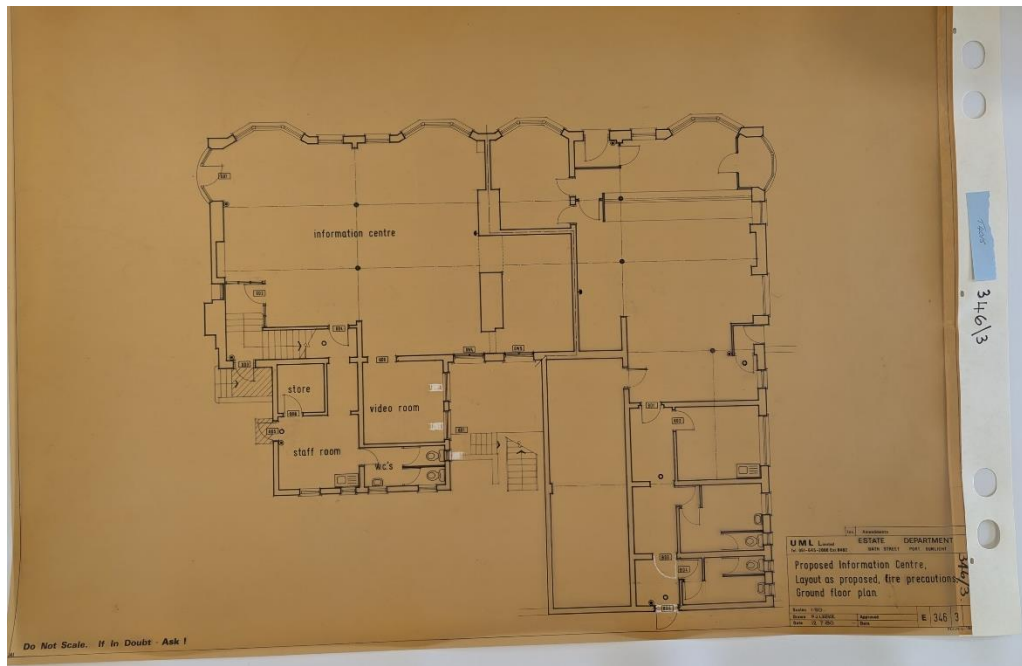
Ground floor existing conditions plans, 1980. Created by UML Estate Department ahead of the adaptive use of the spaces at 94-96 Greendale Road for the Information Centre. This drawing is held in the collections of Port Sunlight Village Trust, Accession Number 346/3.
